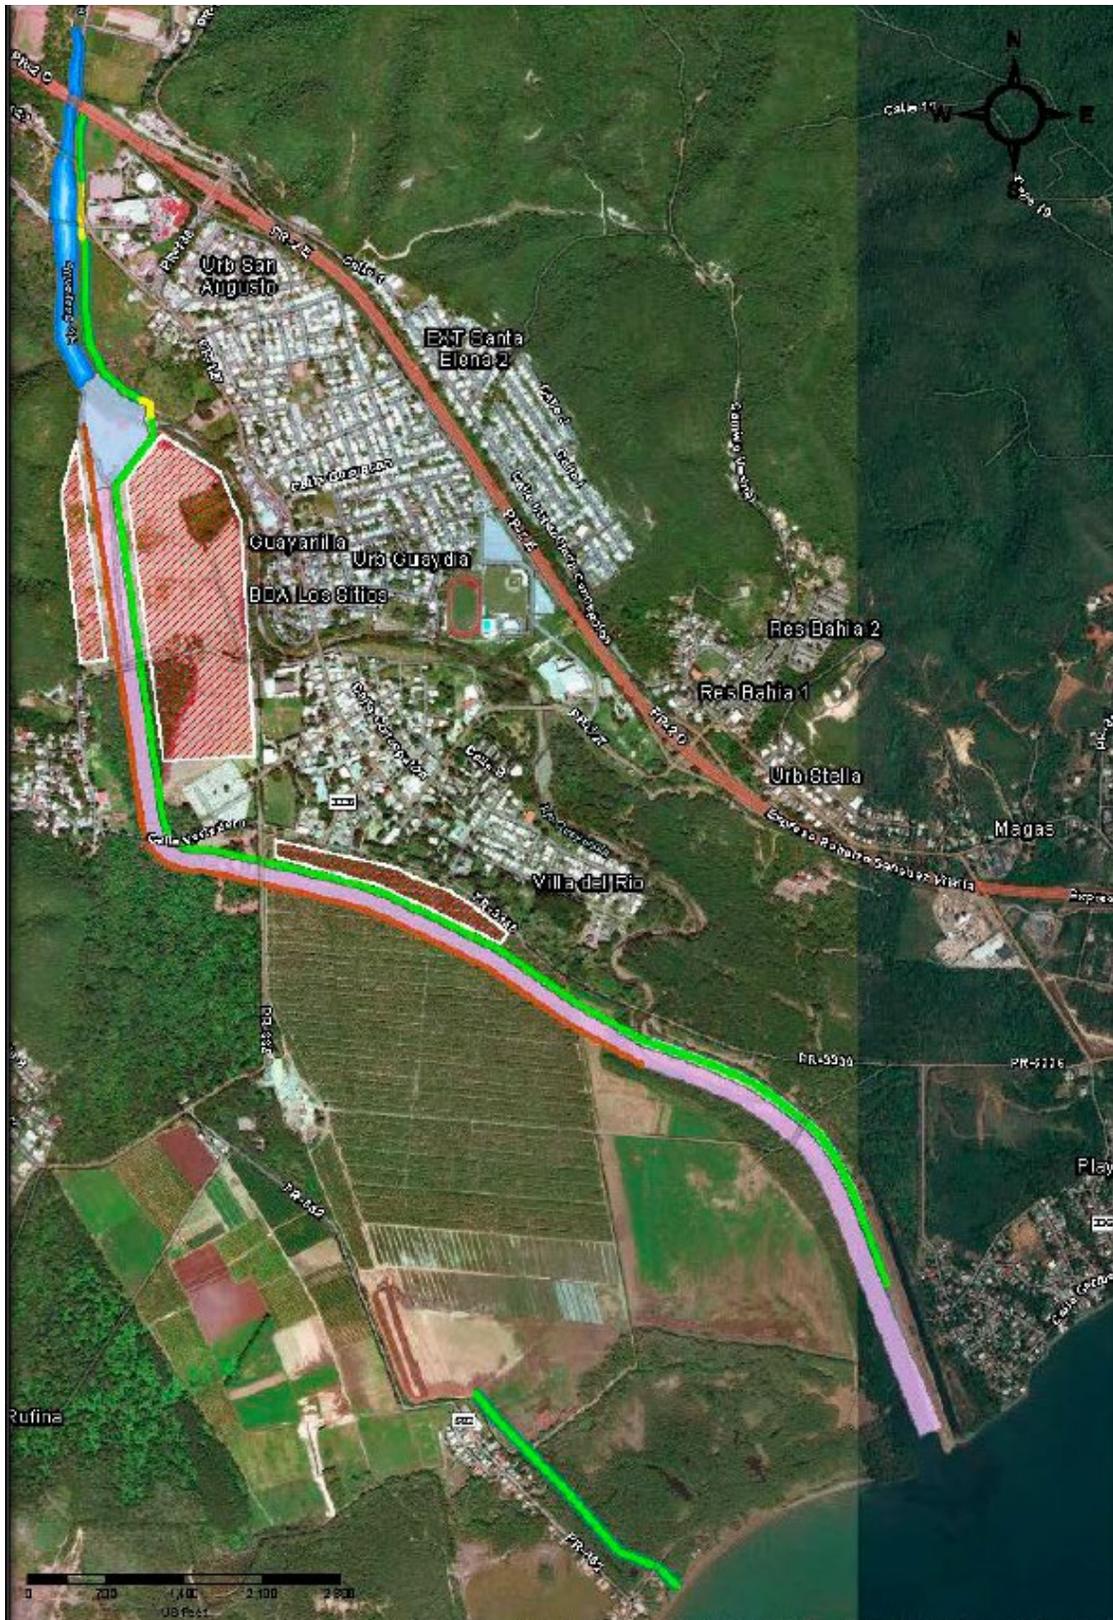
Final Plan Diversion Channel South w/ Single Levee Protection (Corps 2020)
